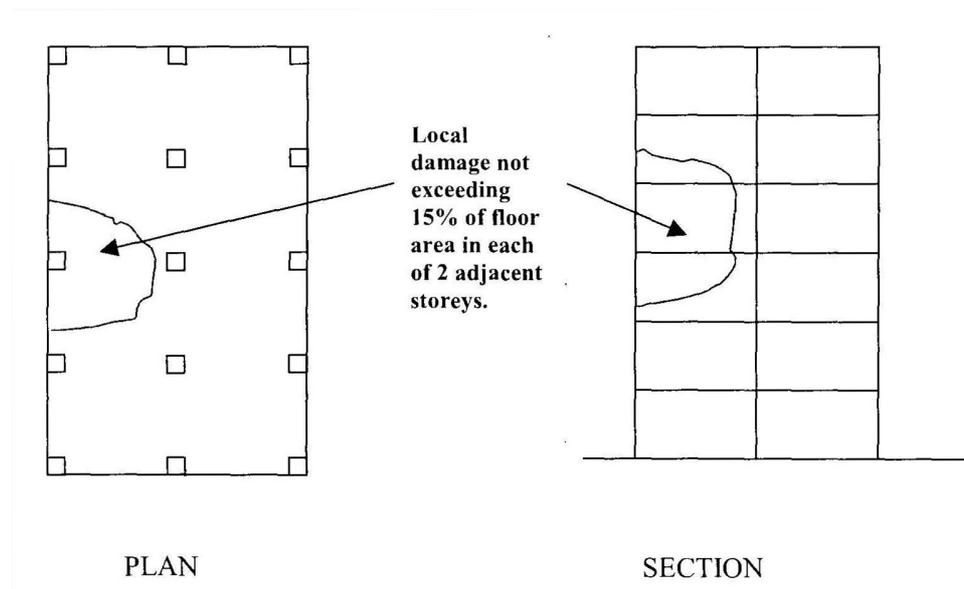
Recommended limit of admissible damage (Source: Eurocode 1, prEN 1991-1-7)
